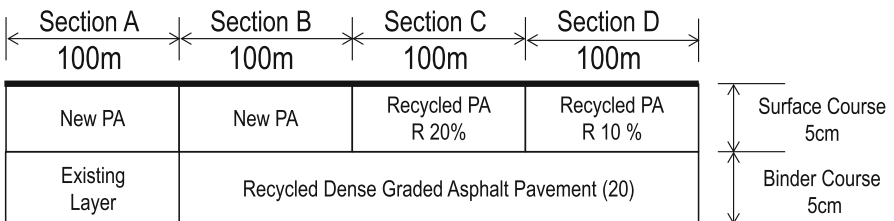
Types of an asphalt mixture and the pavement structure used for the test construction
